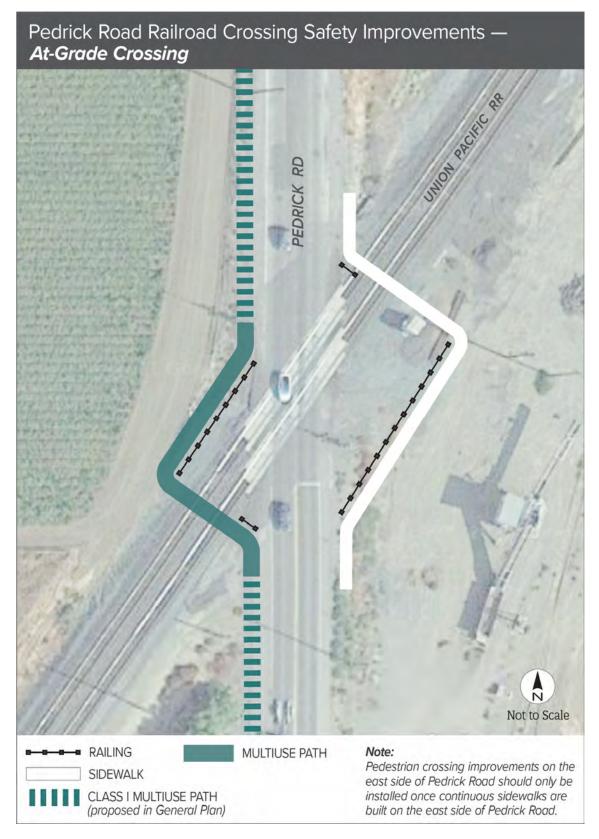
PEDRICK ROAD AT-GRADE RAIL CROSSING SAFETY IMPROVEMENTS
